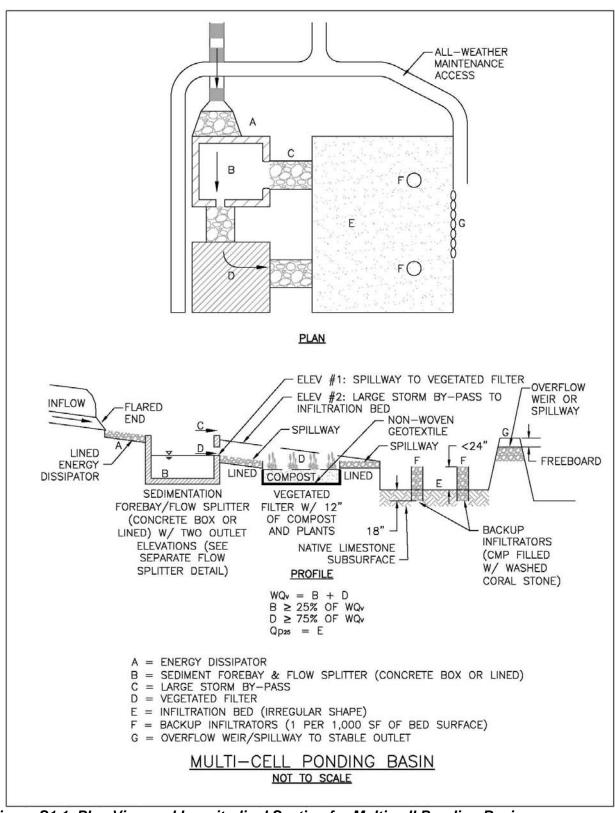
Plan View and Longitudinal Section for Multi-cell Ponding Basin.
